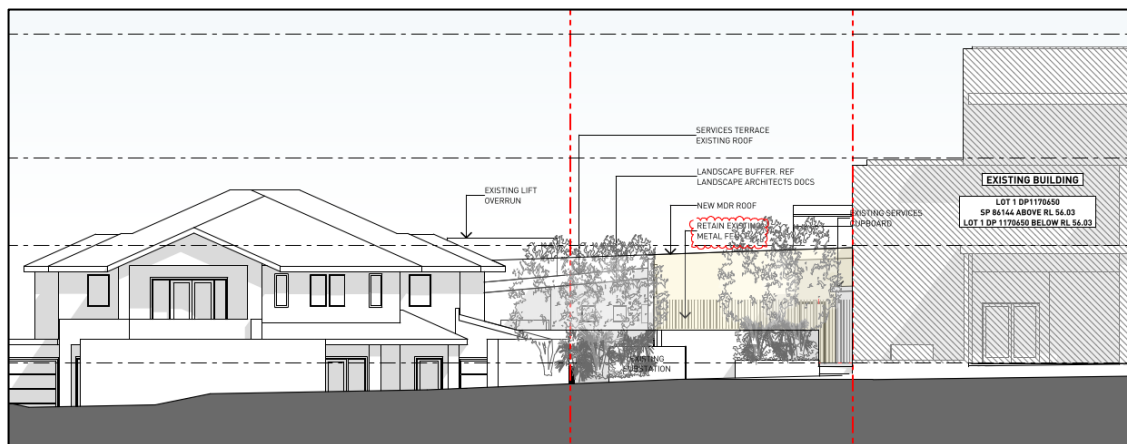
Proposed South Elevation (Gannet Street frontage)
